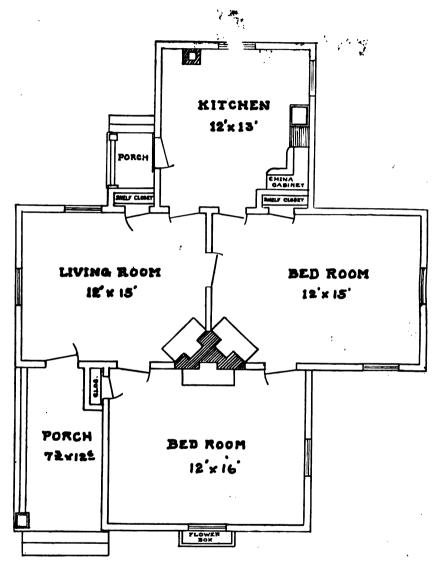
PLAN OF BETTER-TYPE COTTAGE SHOWN IN FIG. 31.
